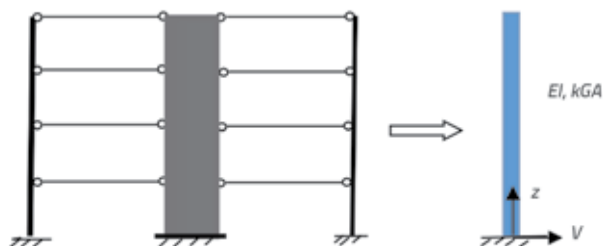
Steel plate wall structure idealized as a Timoshenko beam
